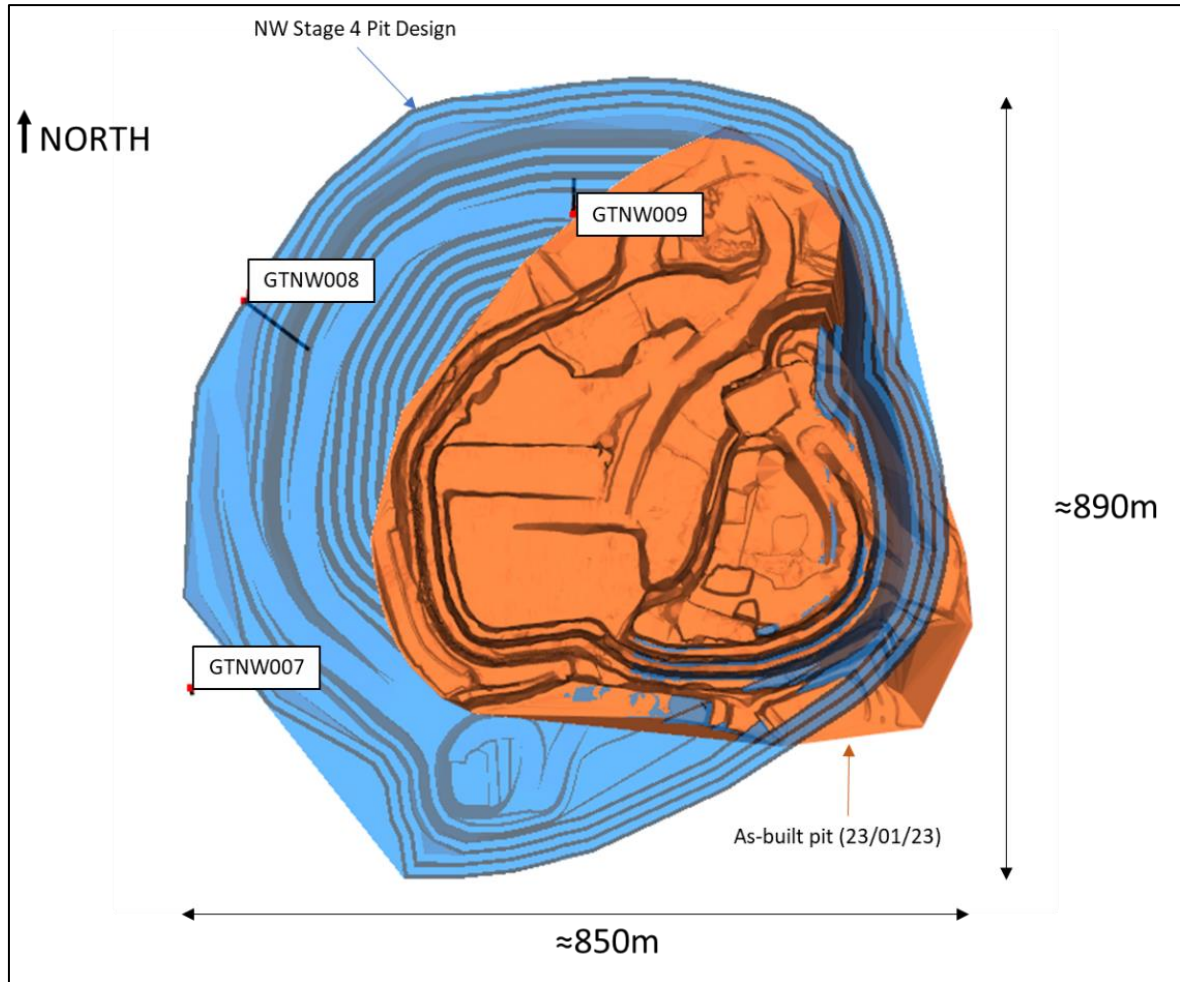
Plan view of Mt Cattlin, with the location of the geotechnical drill holes and basic pit dimensions
